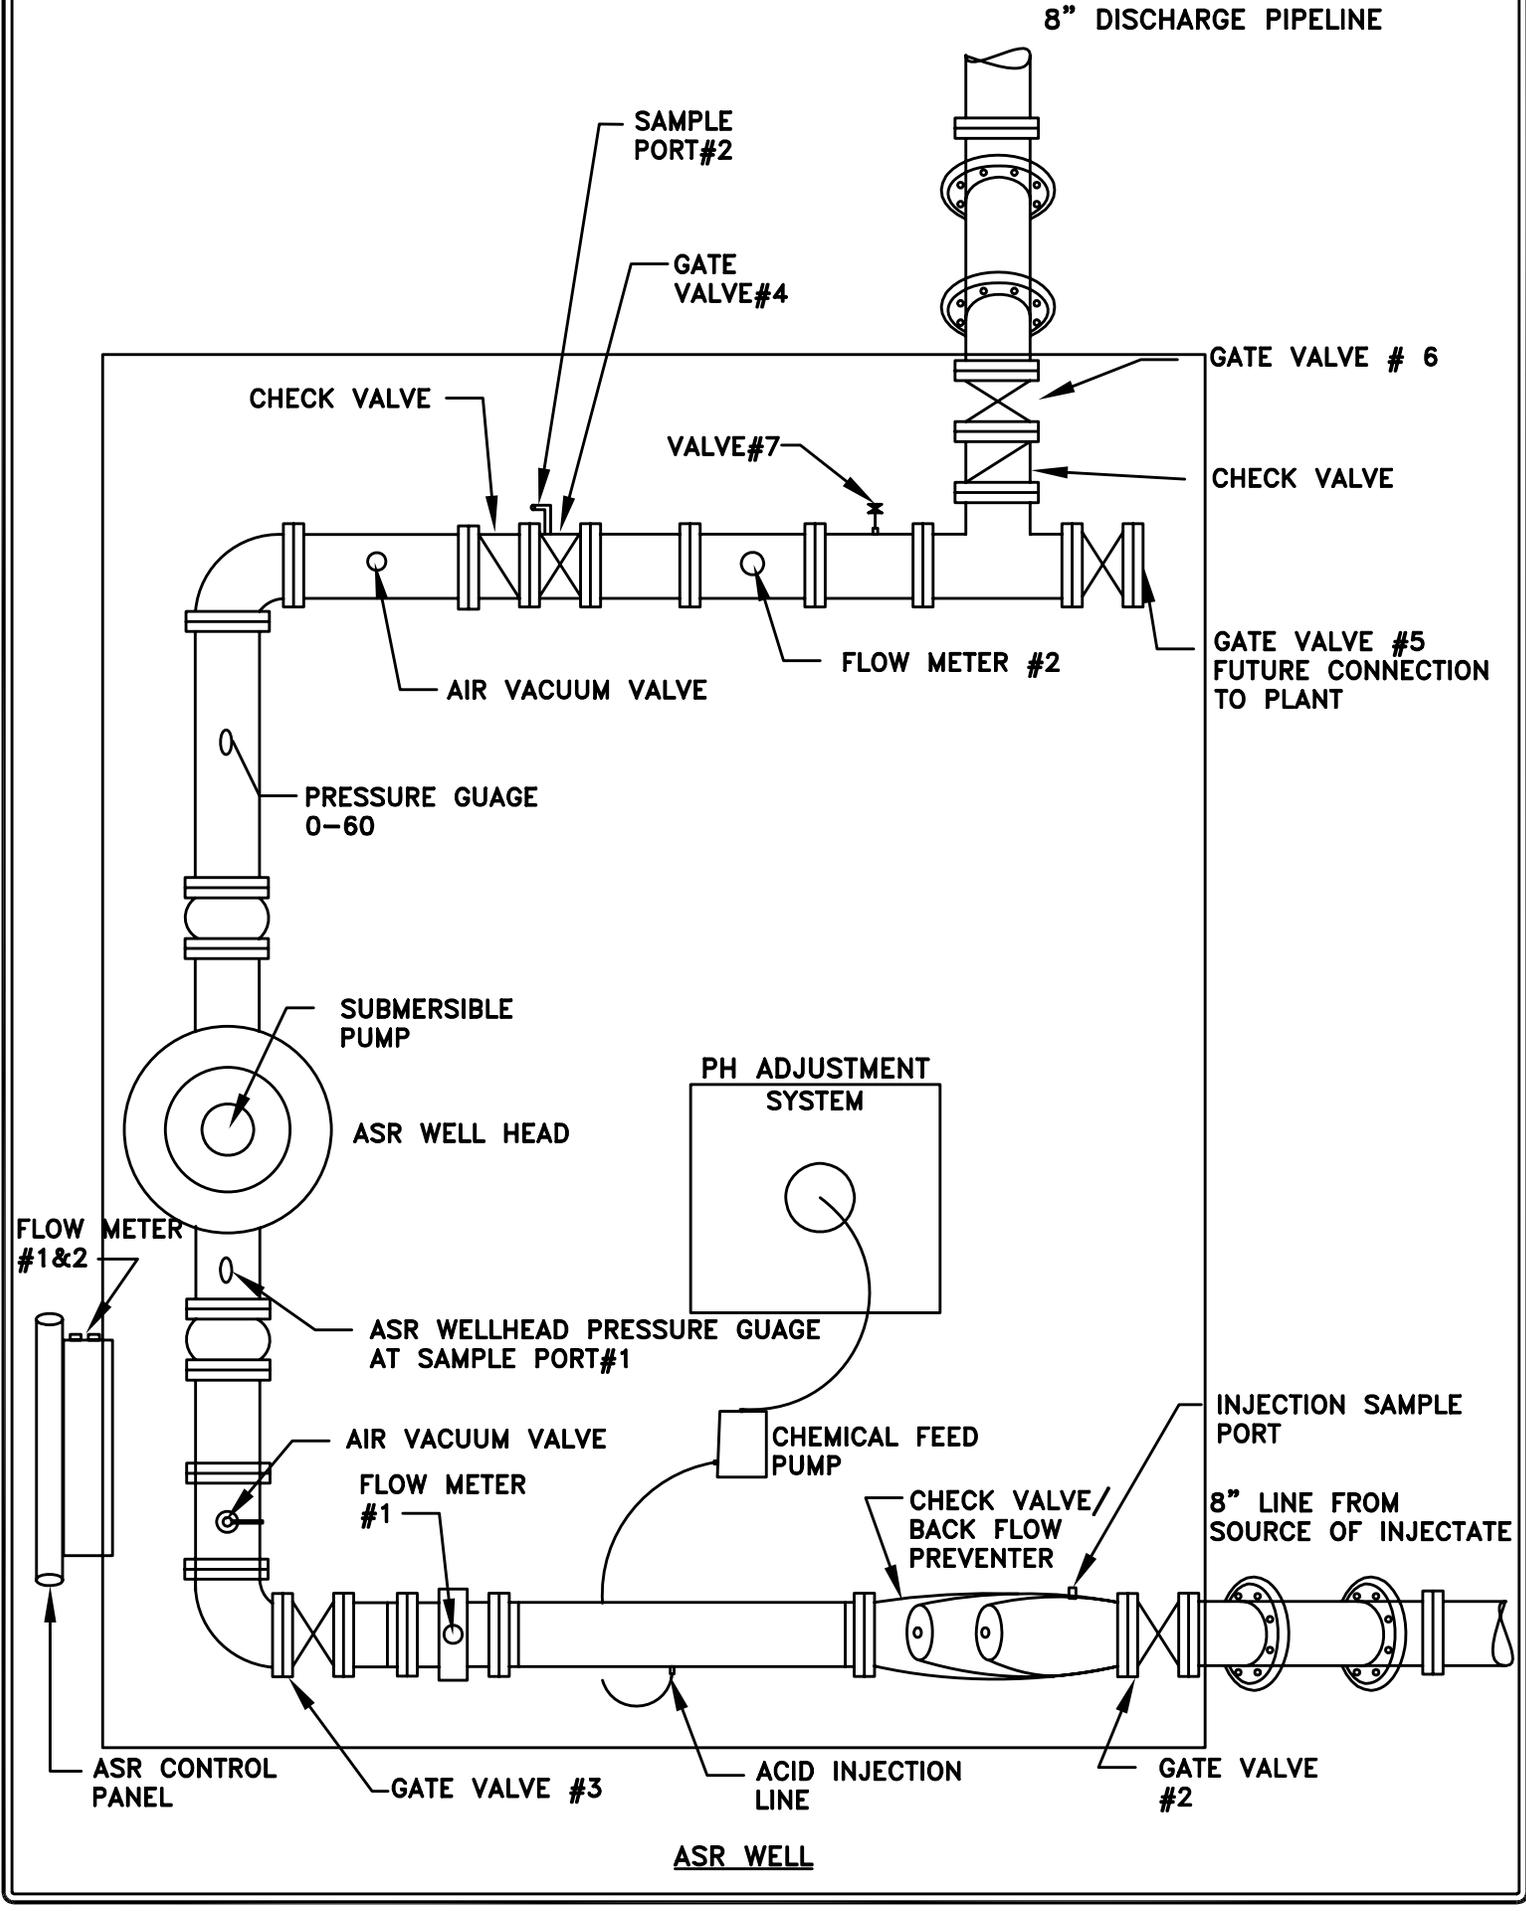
PLAN VIEW OF ASR WELL PAD.
